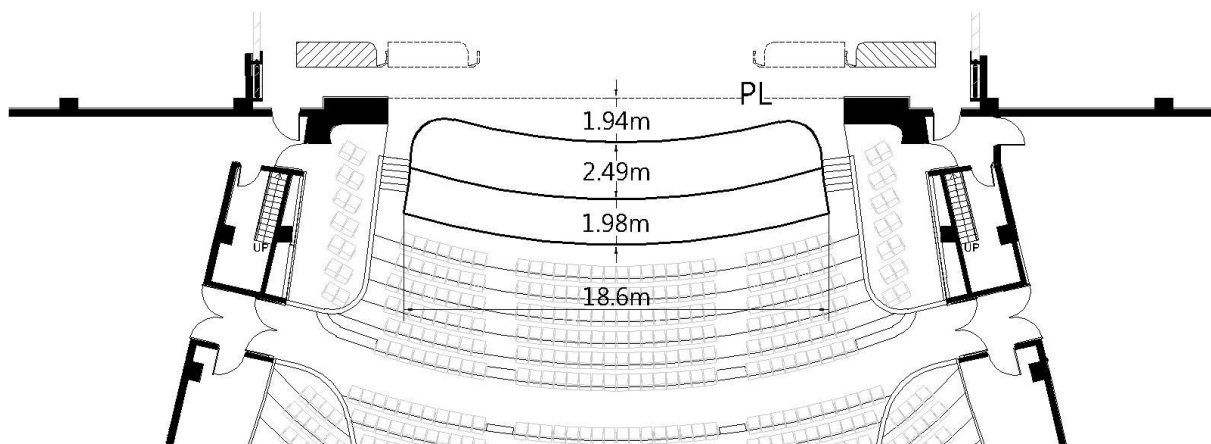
Orchestra Pit Elevation Platform location plan
